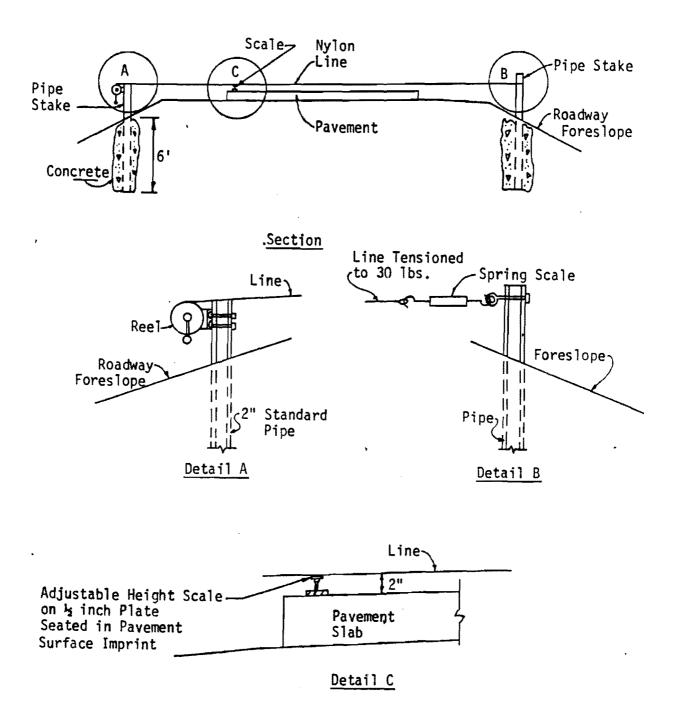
Pipe-wire-scale apparatus for measuing horizontal slab movement.
